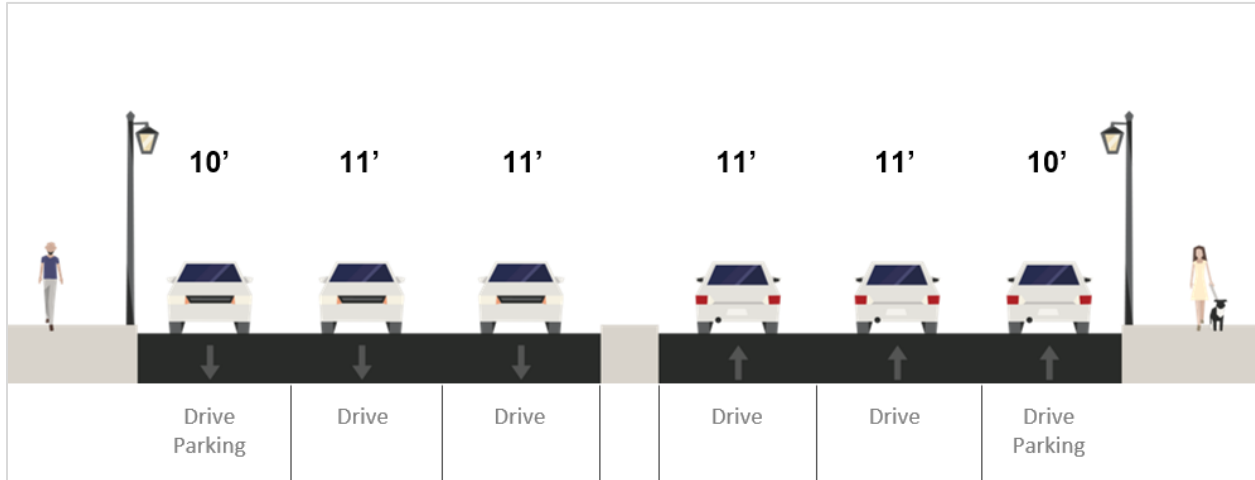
Typical section, existing condition, New Hampshire Ave NW to G St NW.
